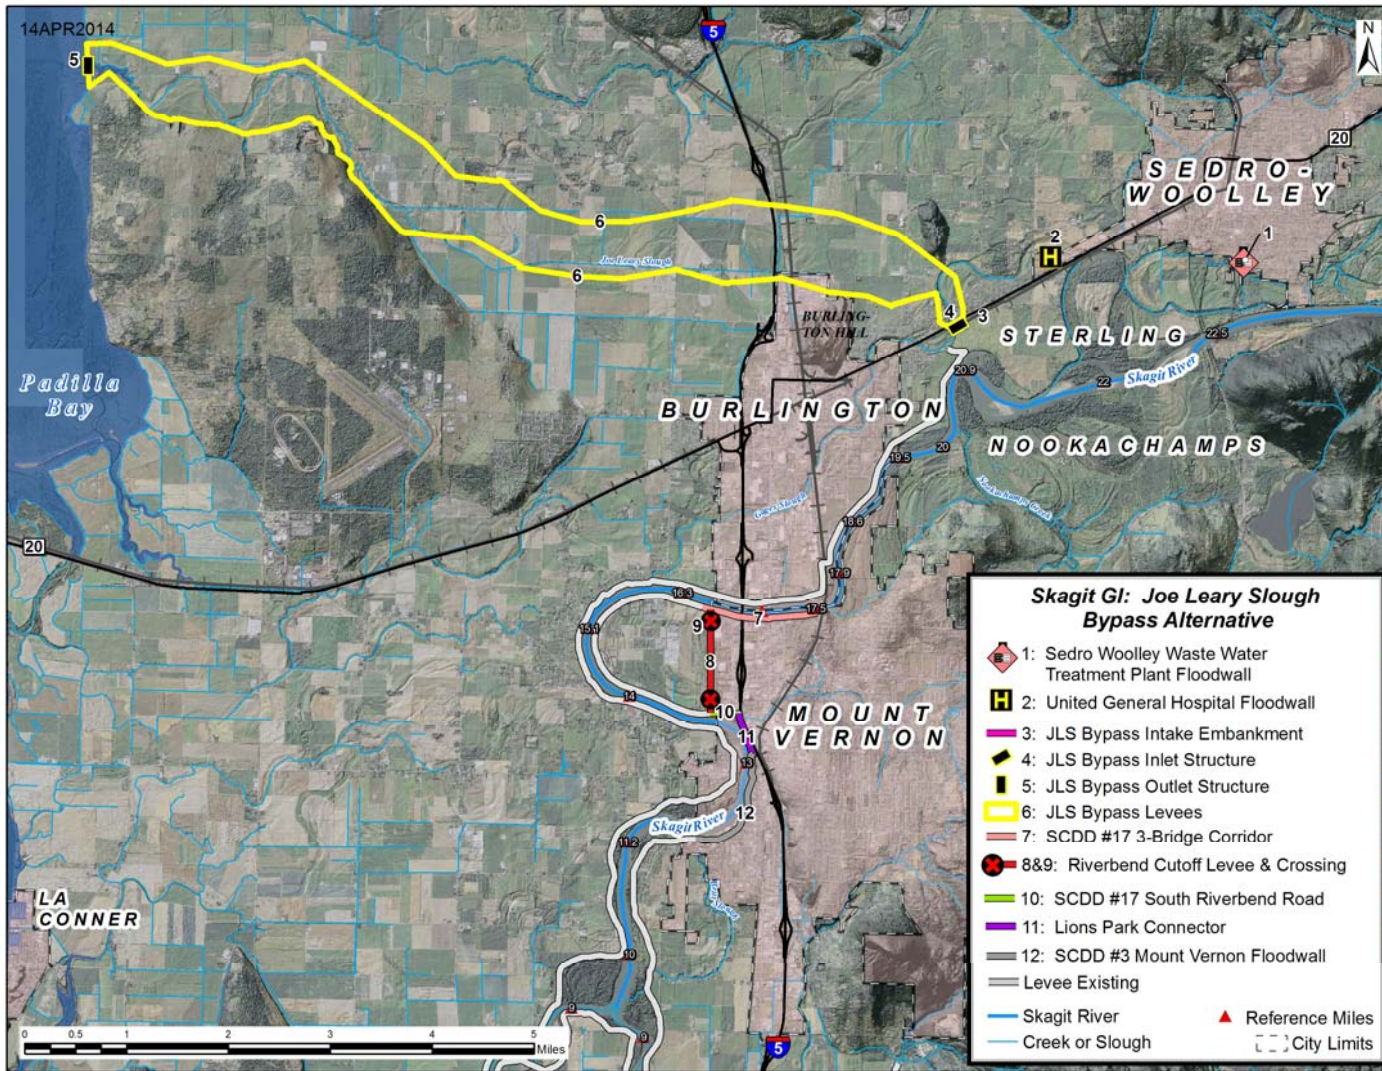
Joe Leary Slough Bypass Wide Confined Channel Alternative
